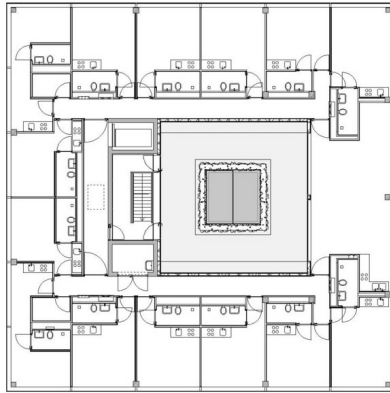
roof floorplan [Archdaily, n.d.]
